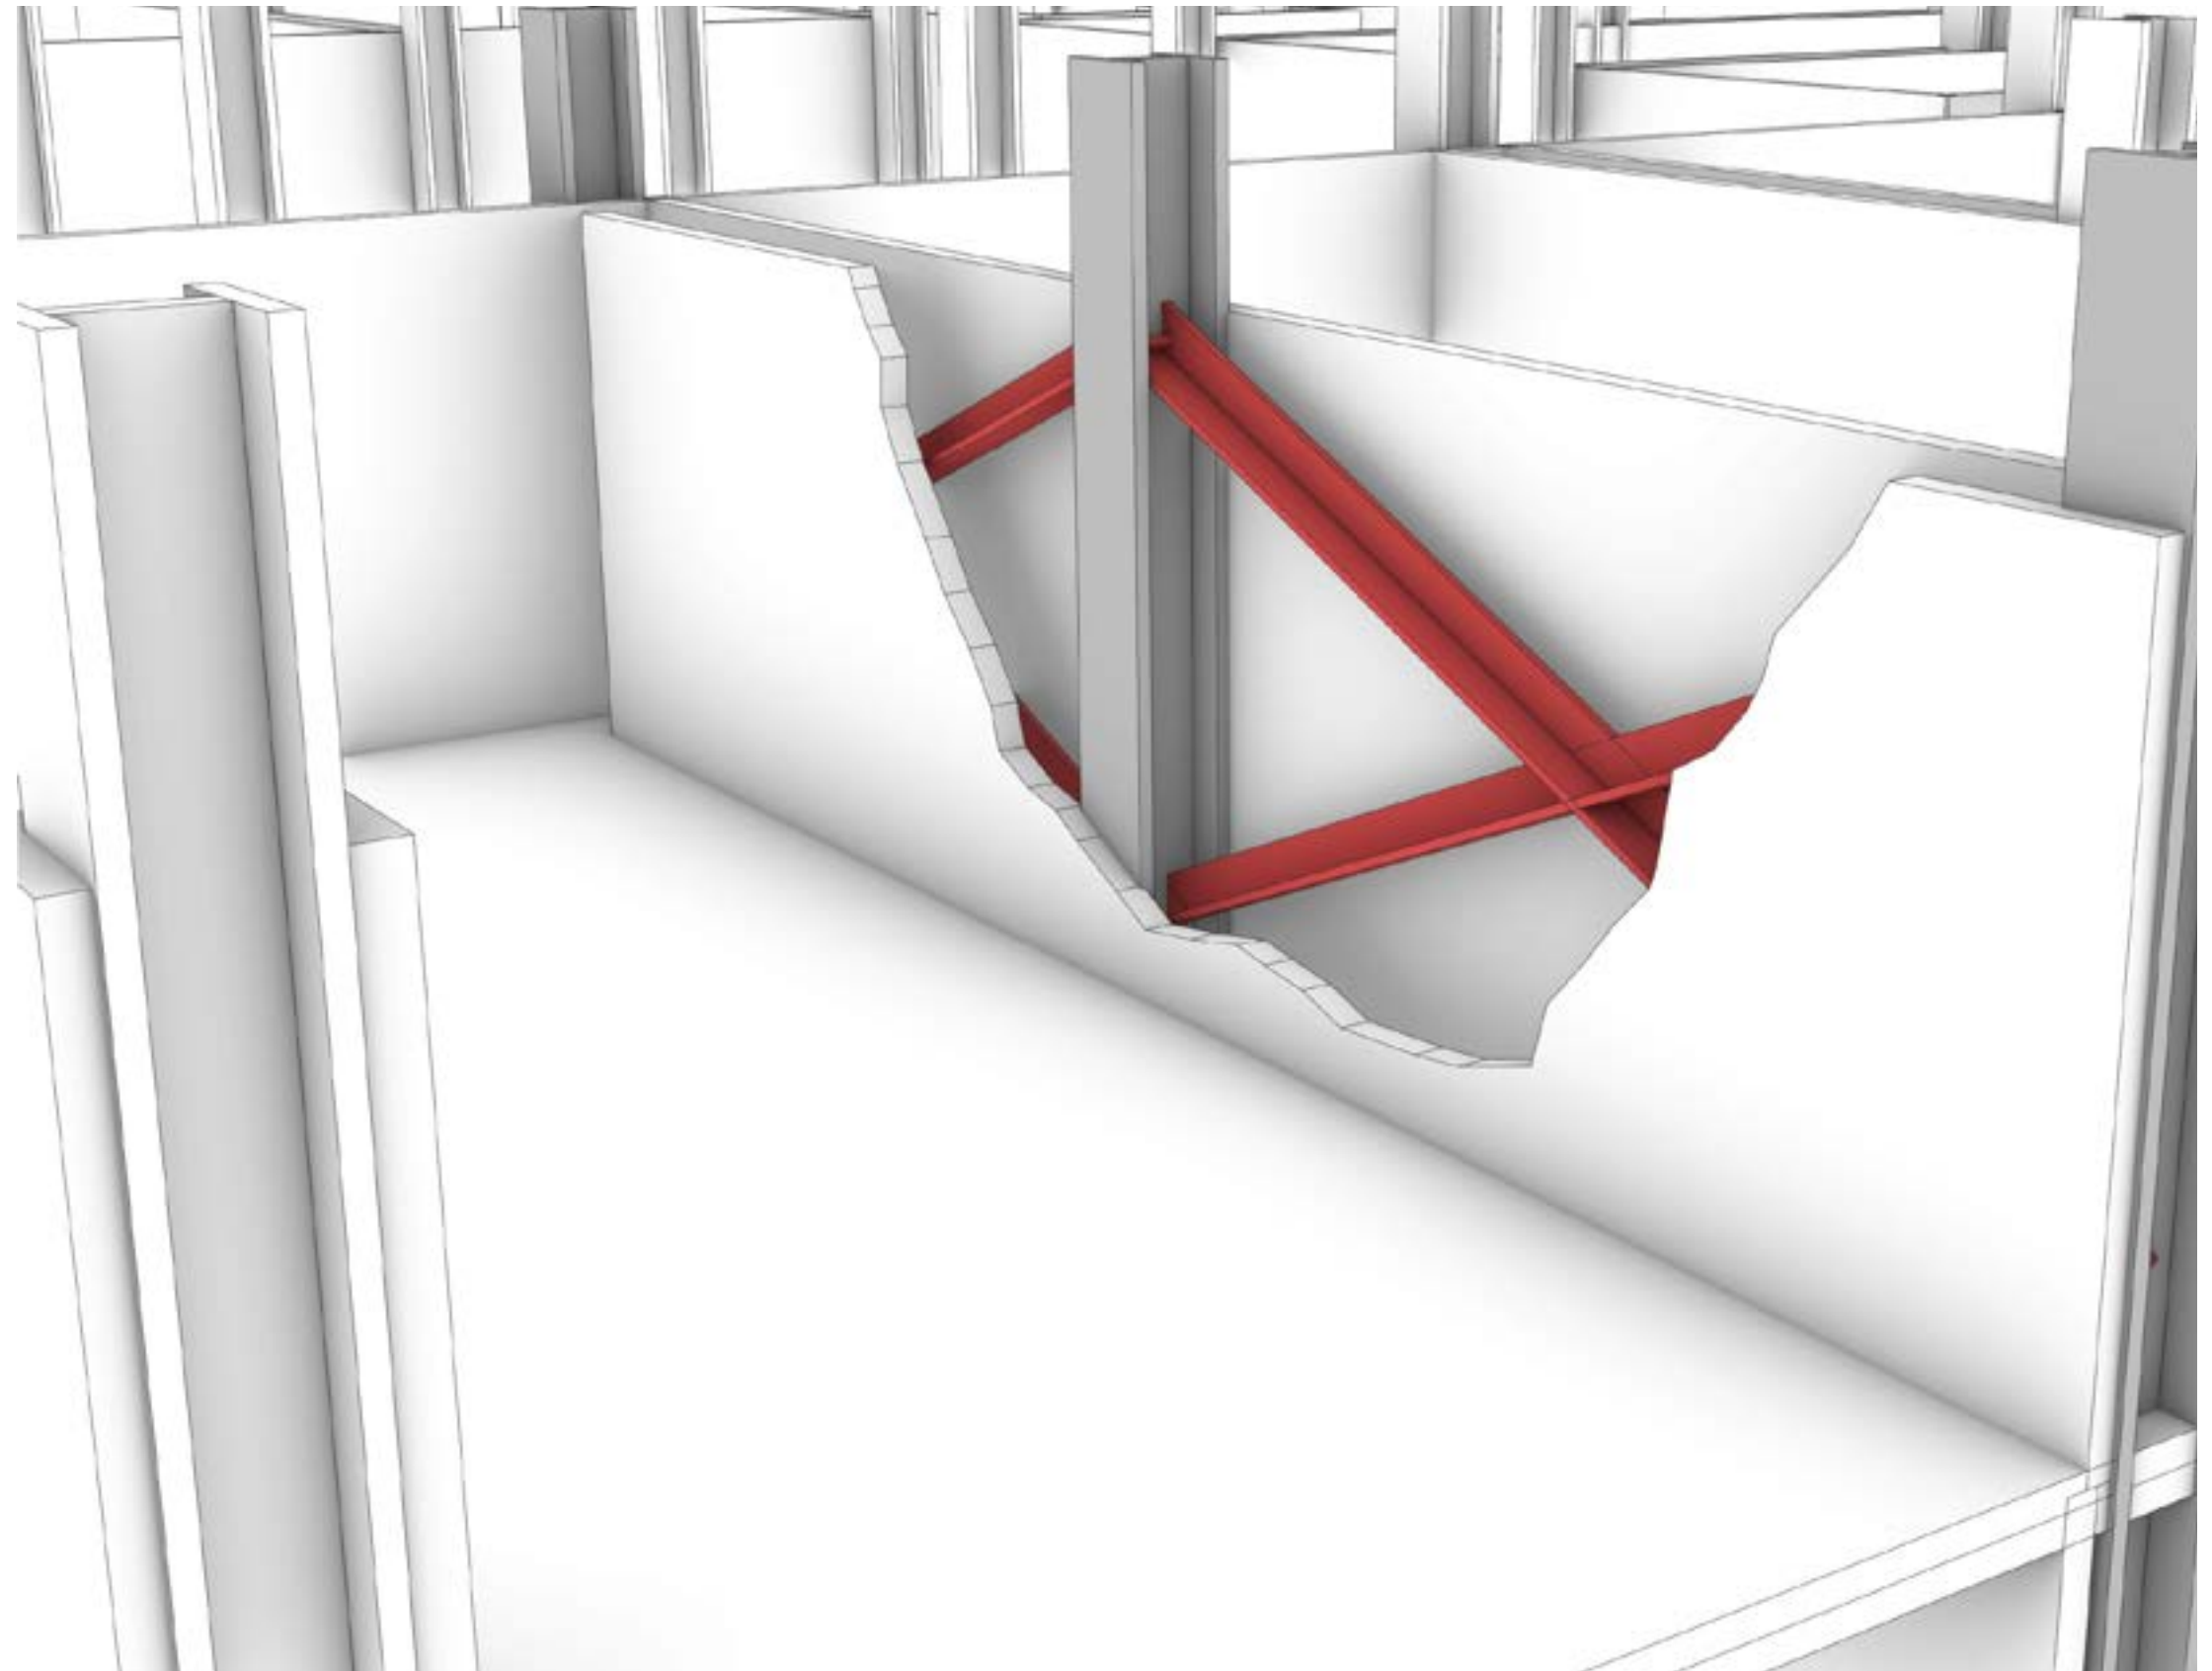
Depiction of structural bracing being implemented between columns inside of the wall.
